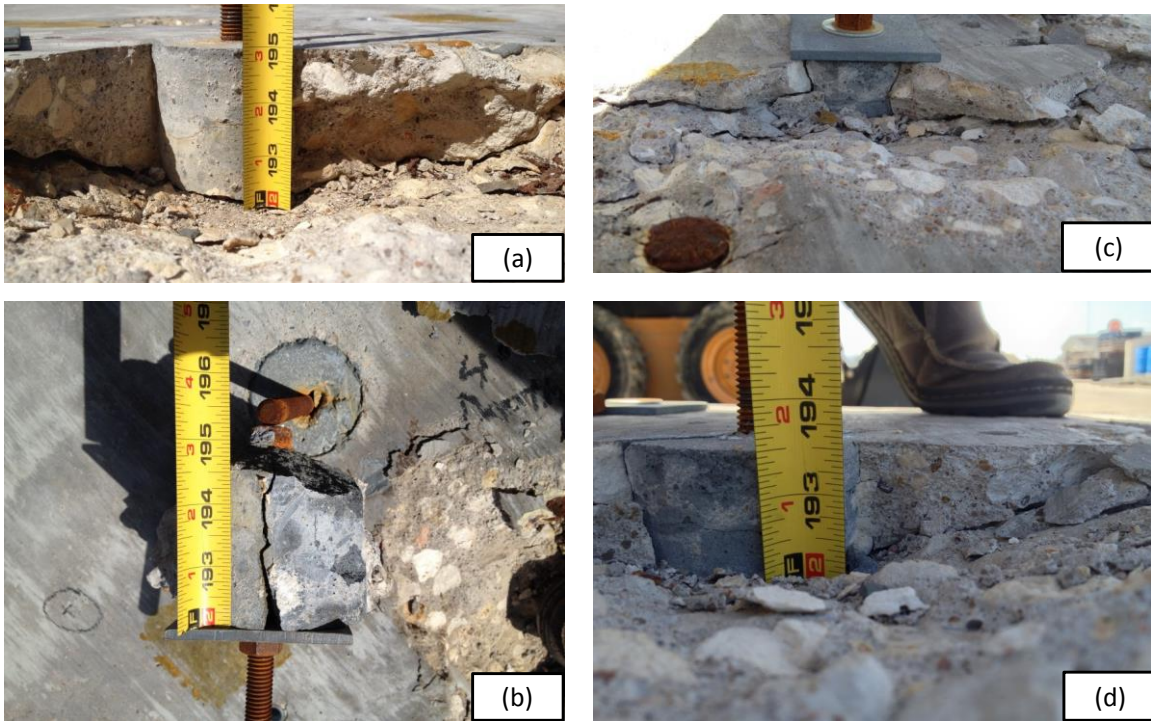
Pictures at anchor failure for informal pullout tests. (a) & (b): full concrete breakout cone; (c) & (d): shallow breakout cone.
